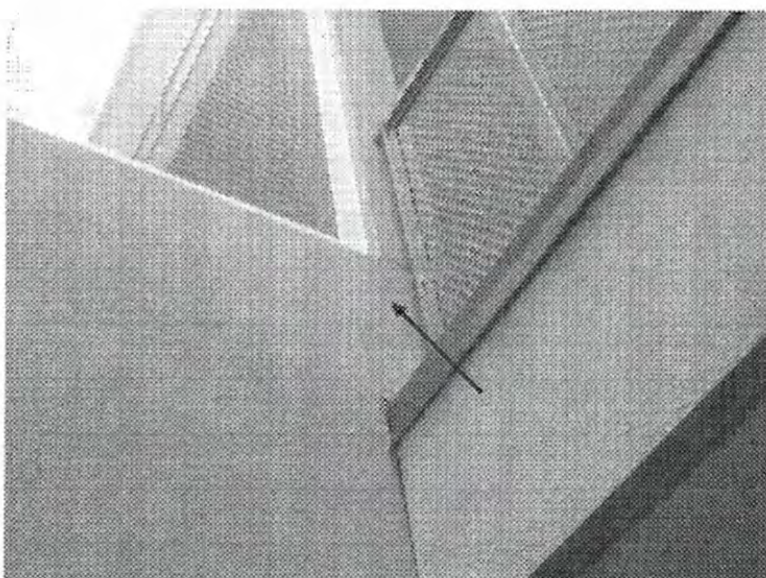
Small crack at base of window near breezeway; note lack of vertical control joint.
